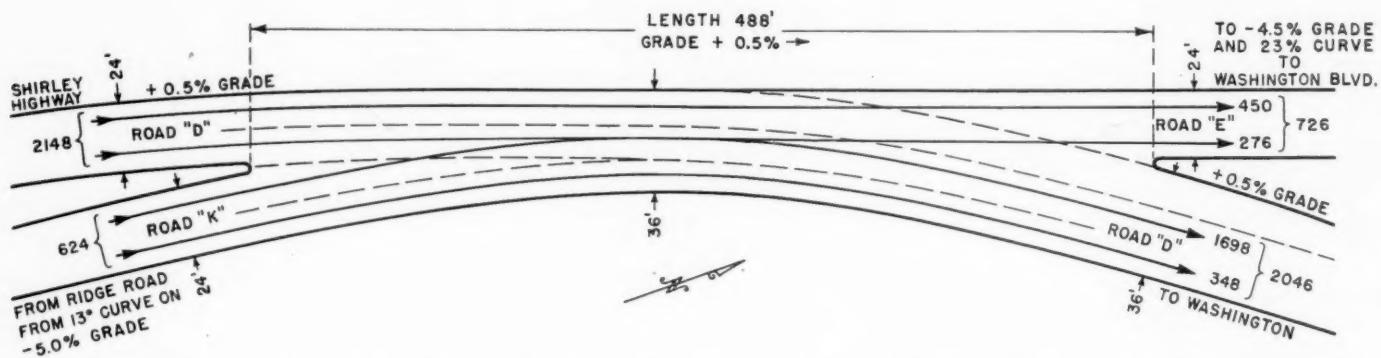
Maximum observed hourly traffic volume on mixing lanes for north-bound traffic at junction of road K from Ridge Road and the Shirley Highway, Arlington, Va.
